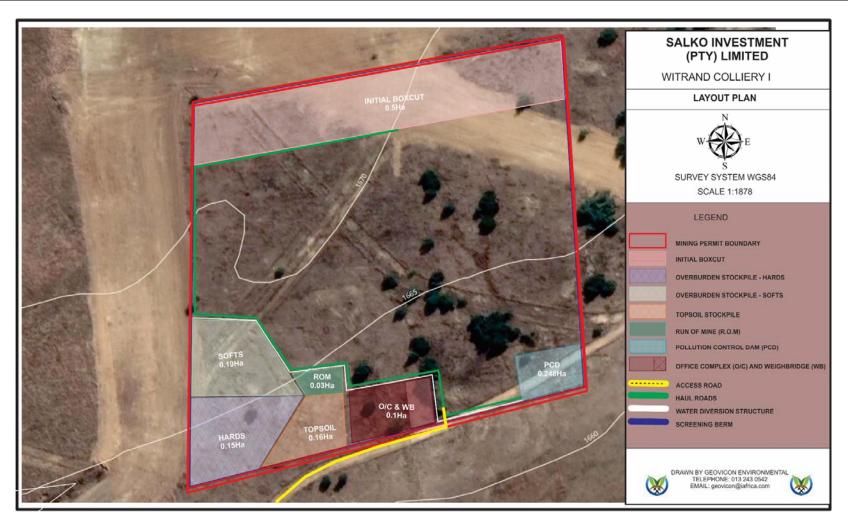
Surface layout plan, see attached Appendix C for an A3 format.
